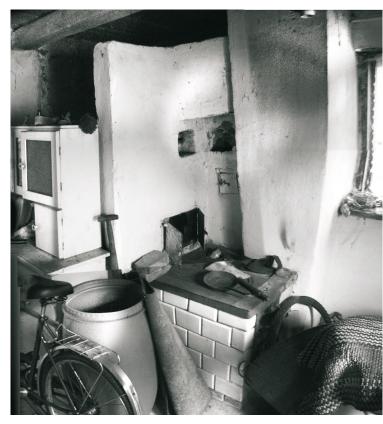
Inside an earthen house in Tworkowice (No. 9); source: the authors, 2009
